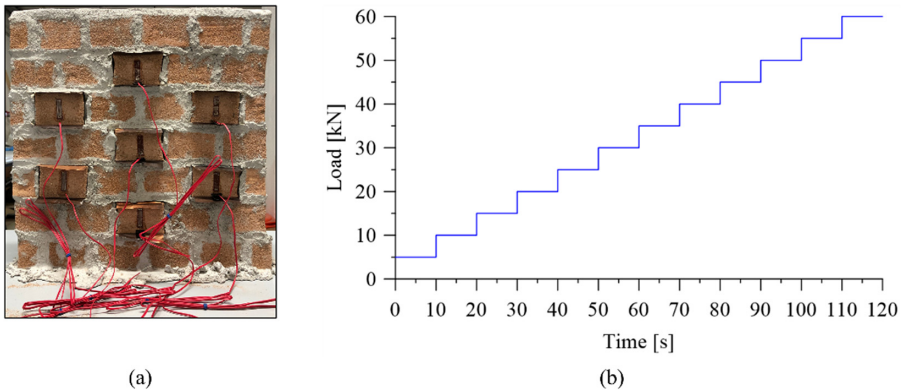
Eccentric axial compression tests on a small-scale masonry wall specimen: (a) Picture of the tested structural element; (b) Applied load history.
